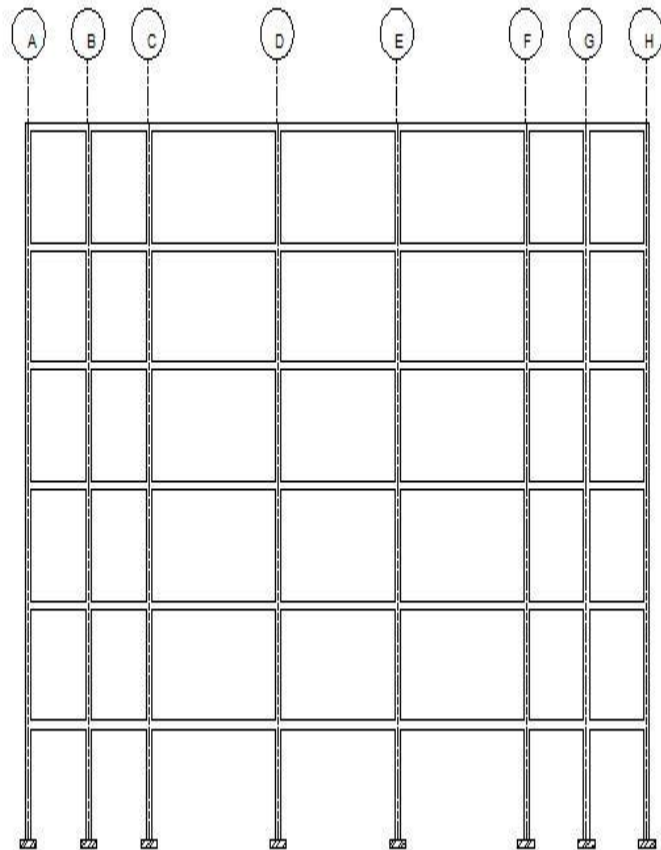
Plan of six- story RC building (all dimensions are in mm)
